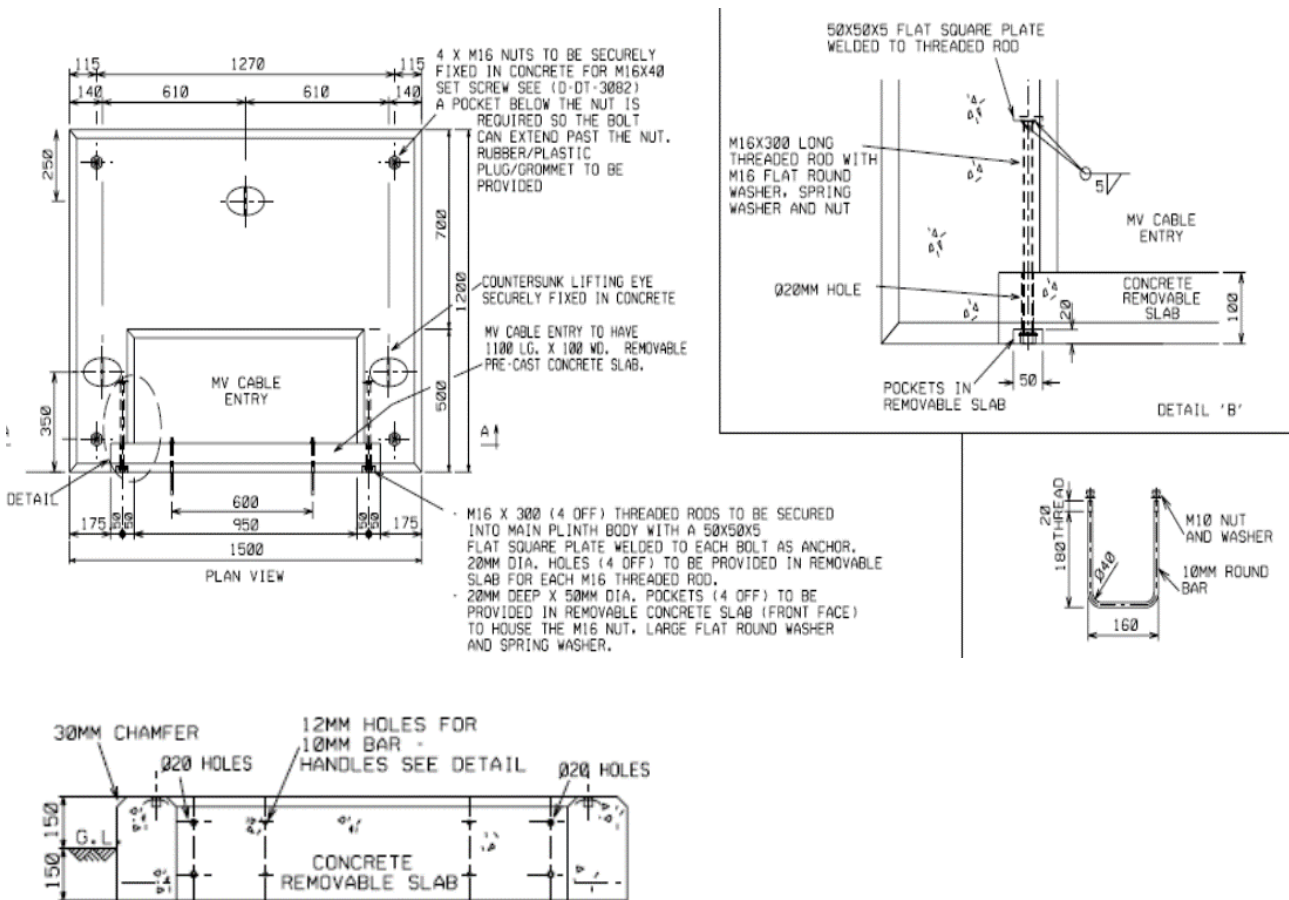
11kV 3-way RMU Plinth details (Pre-cast)
